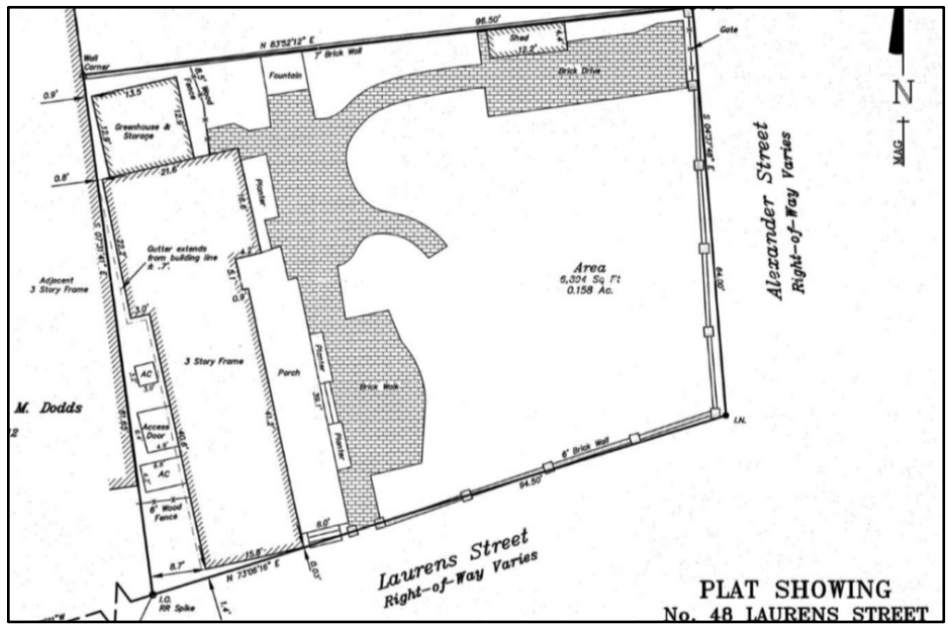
Plat of 48 Laurens, showing main house and addition in relation to property boundaries.
